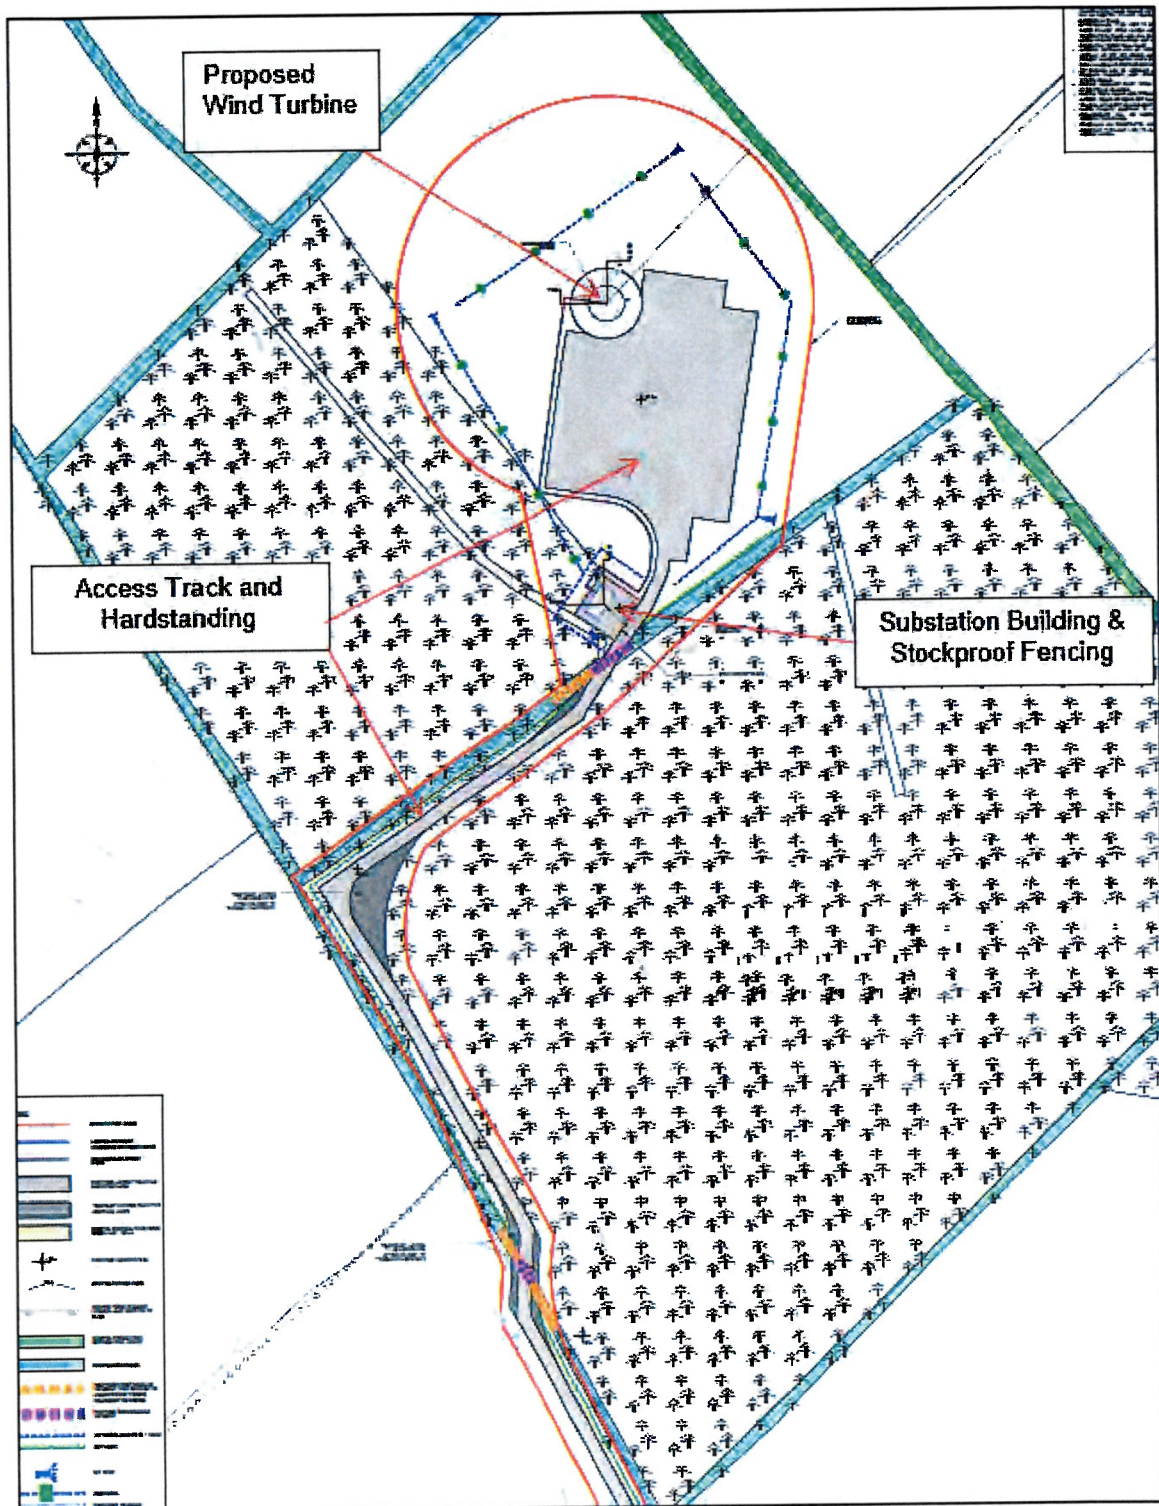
Site Layout Plan with Proposed Development Boundary
